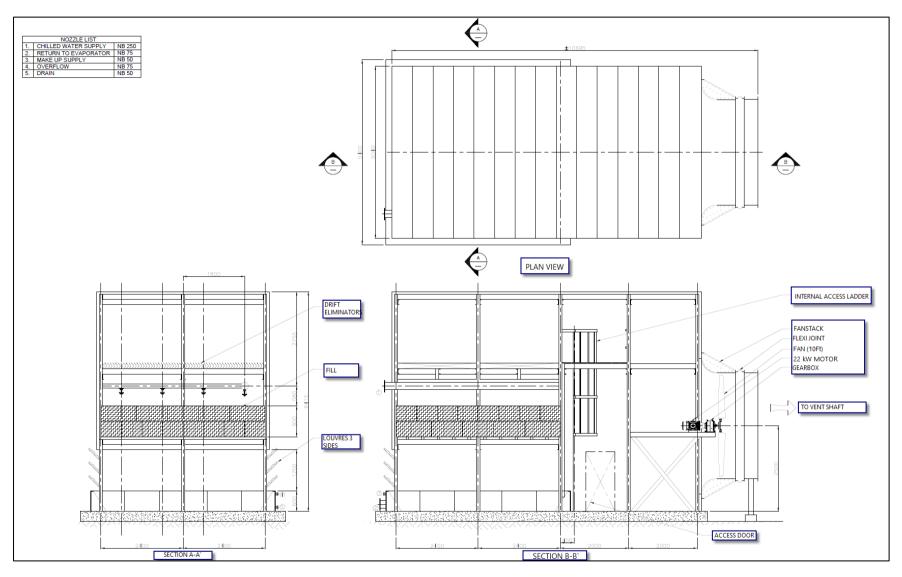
General Arrangement Drawing of a Typical Bulk Air Cooler (BAC) (IWC 2025)
